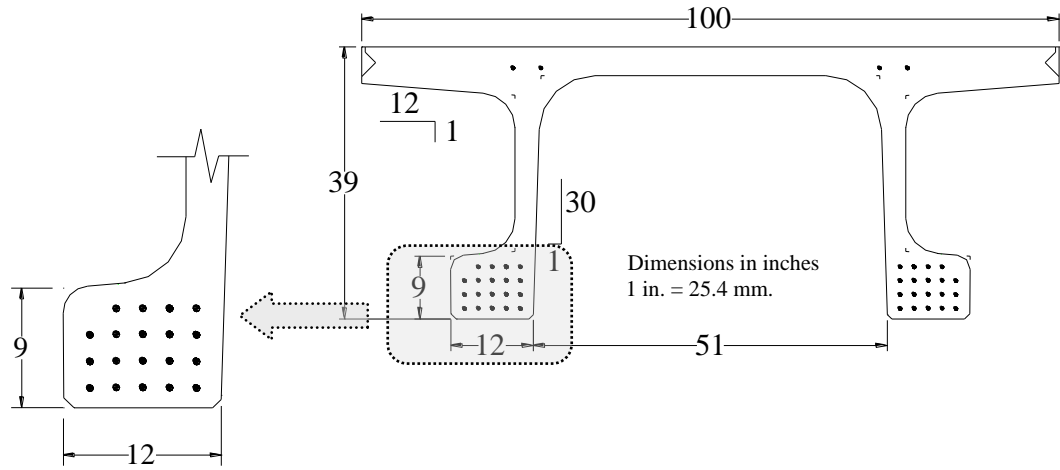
Strand layout of 39-inch-deep section for 95-foot (29.0 m) span
